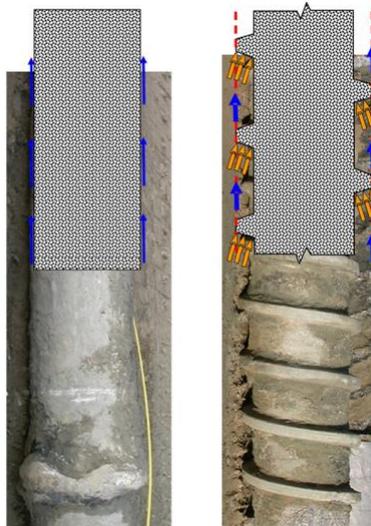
Smooth shaft and threaded shaft soil displacement piles schematic load transfer mechanism
